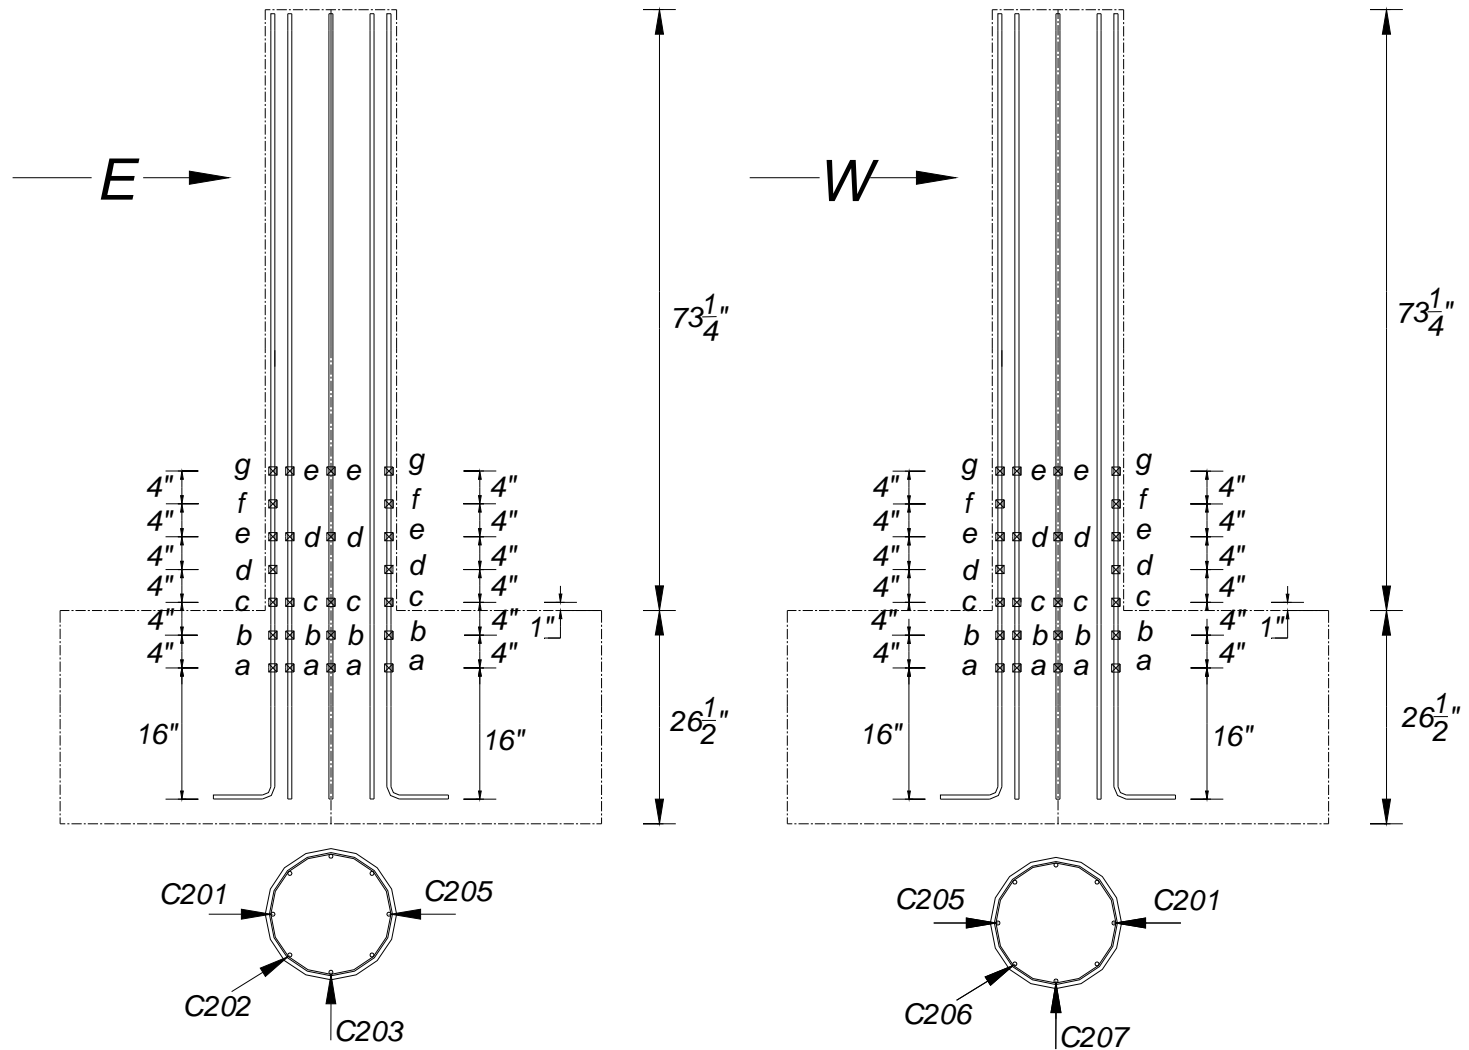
Elevation view of strain gauges location on the longitudinal rebar of TS-2.
